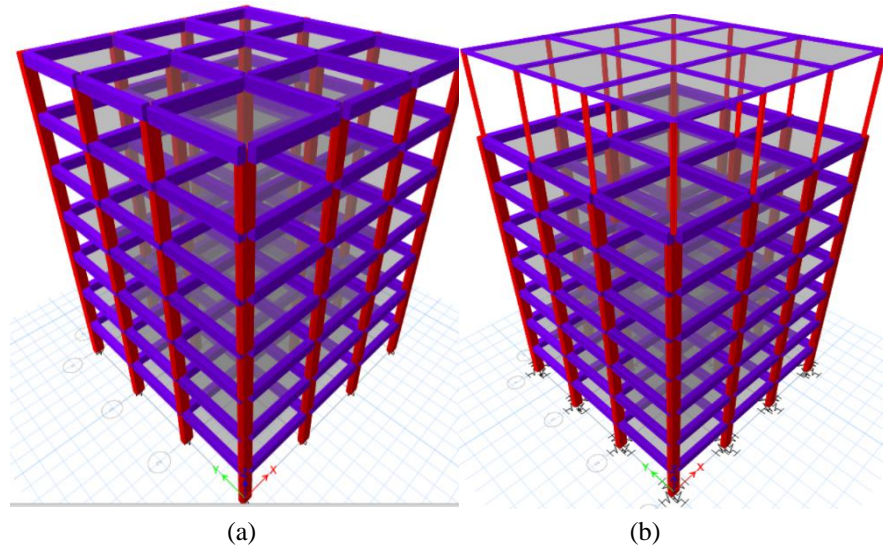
(a) Building without TMD and SSI, (b) Building with TMD and SSI
